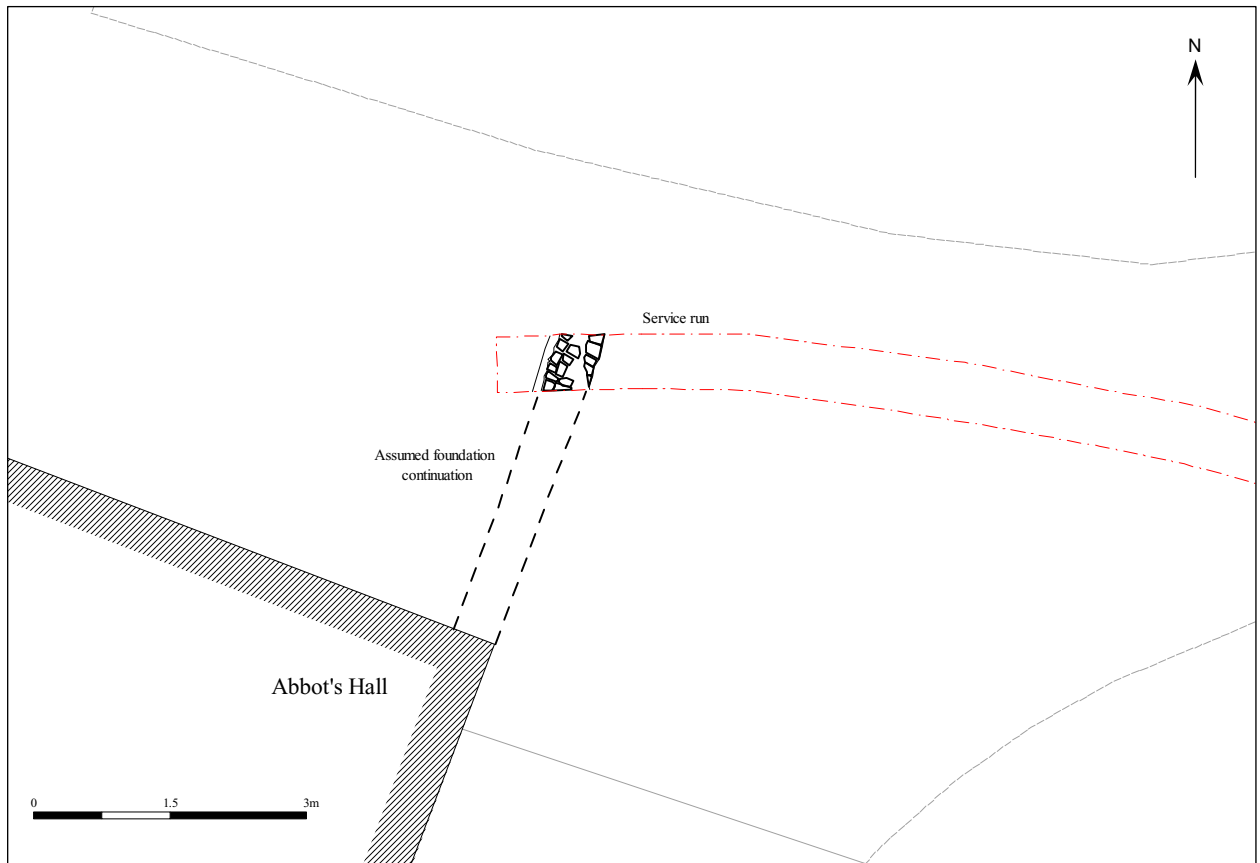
Detail of service run to north of Abbot's Hall, showing wall foundation
